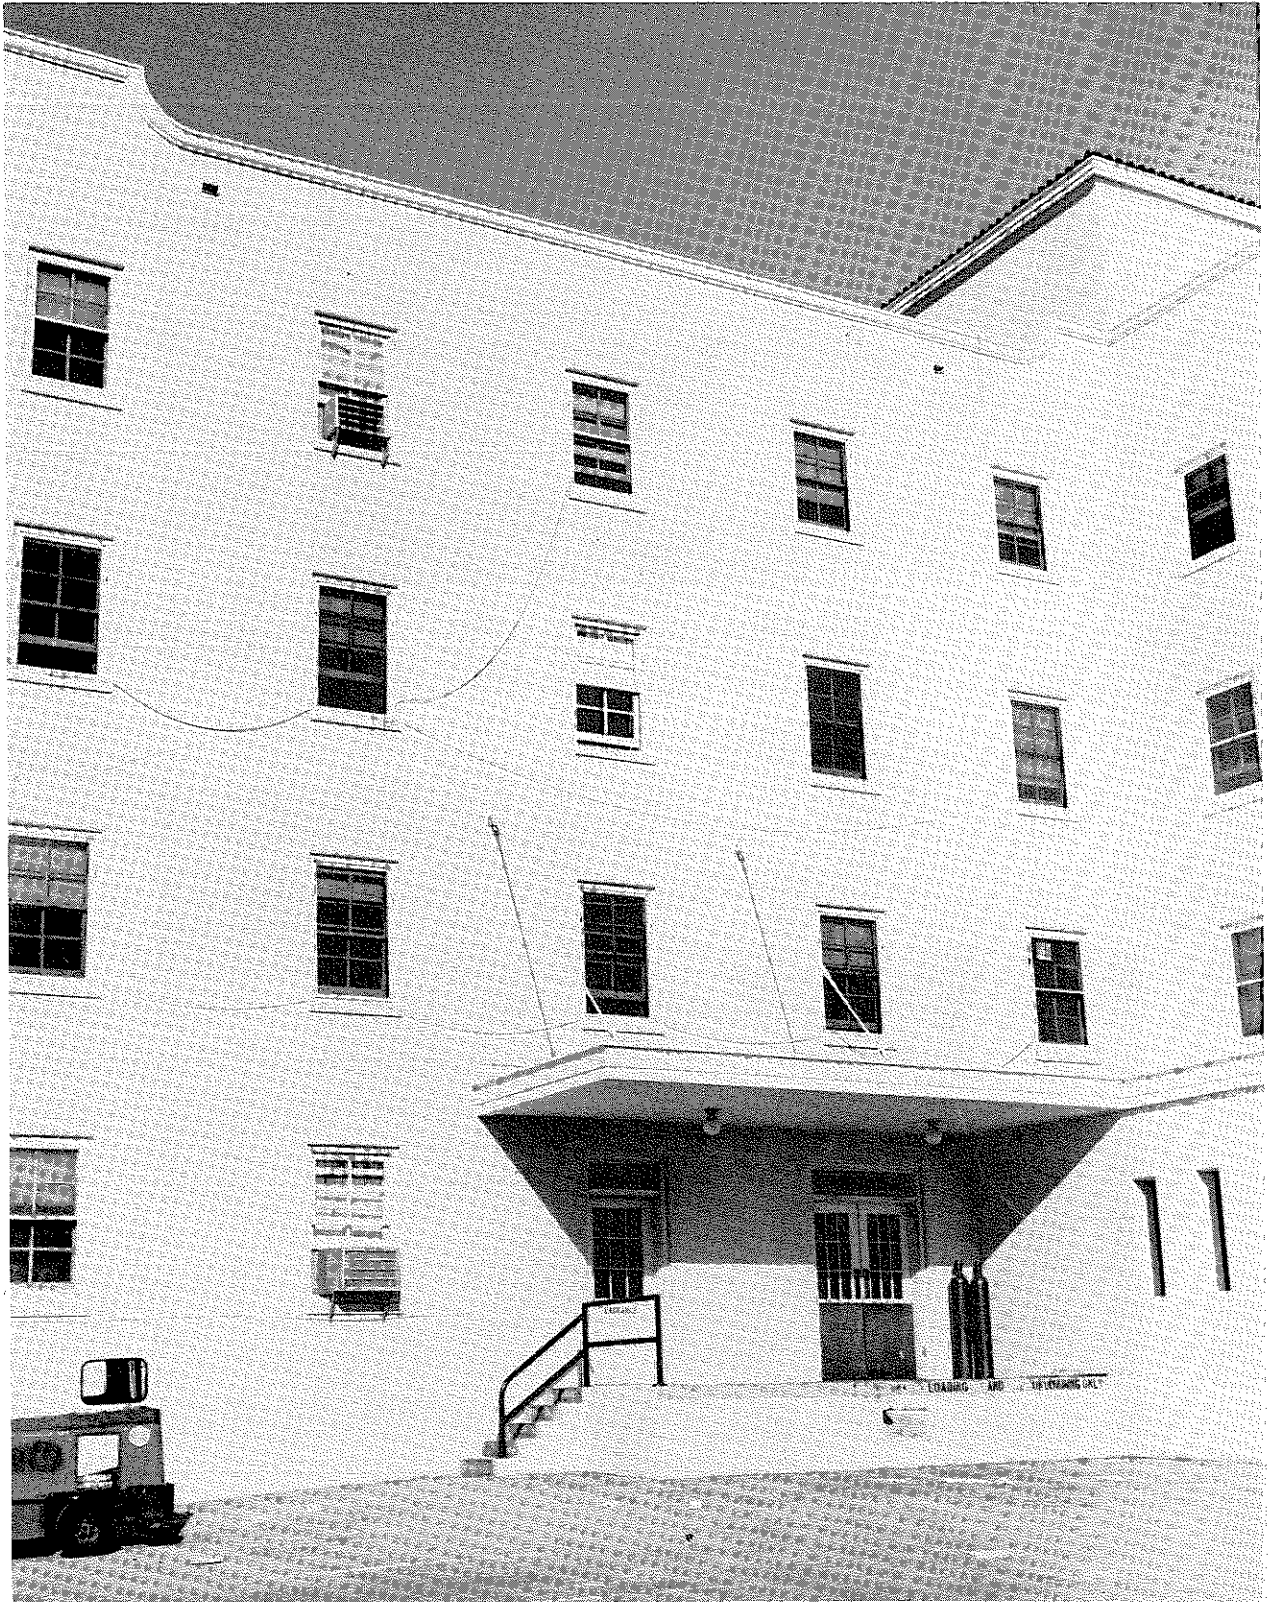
The Main Infirmary Building, a concrete frame and shear-wall building at the Veterans Administration Hospital, was not seriously damaged. The building was constructed in 1949, after earthquake provisions were a part of the building code.
